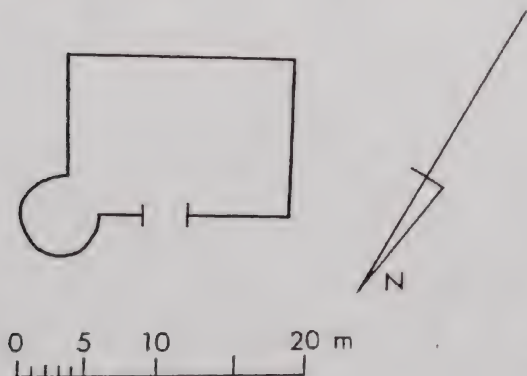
Plan of earthworks at Okato Blockhouse site, 1975.
